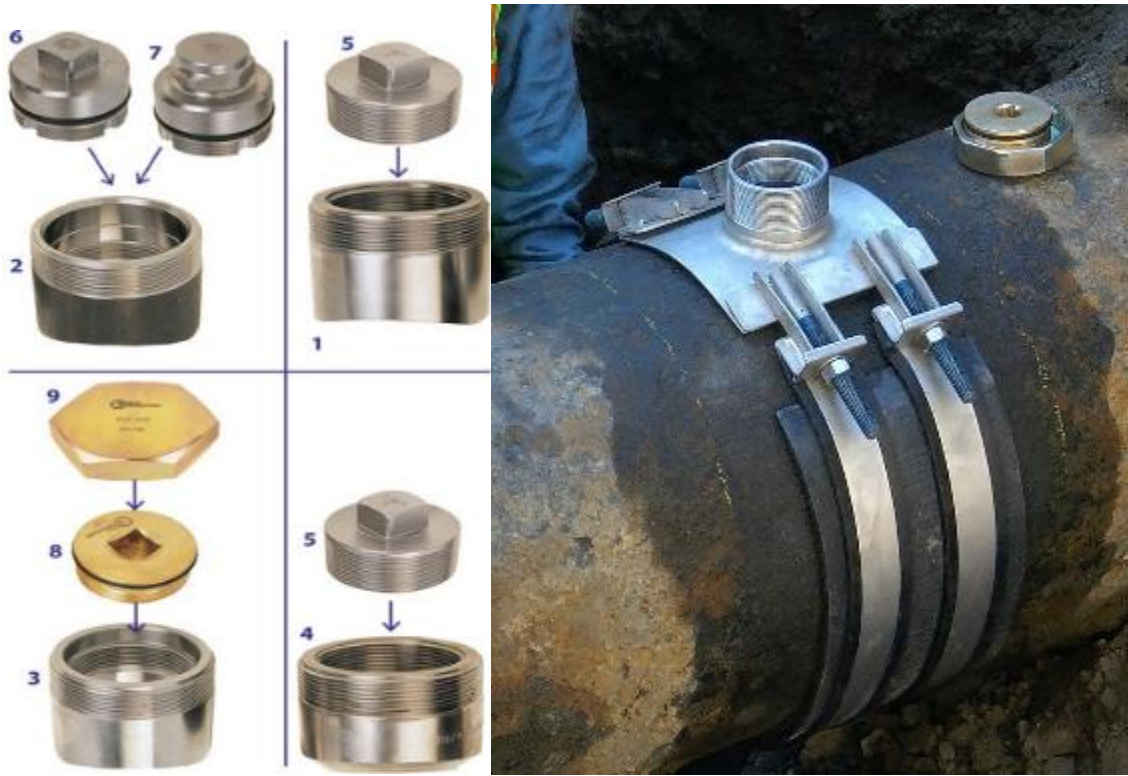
Kleiss steel weld on fittings and stainless steel strap style fitting for cast iron pipe
